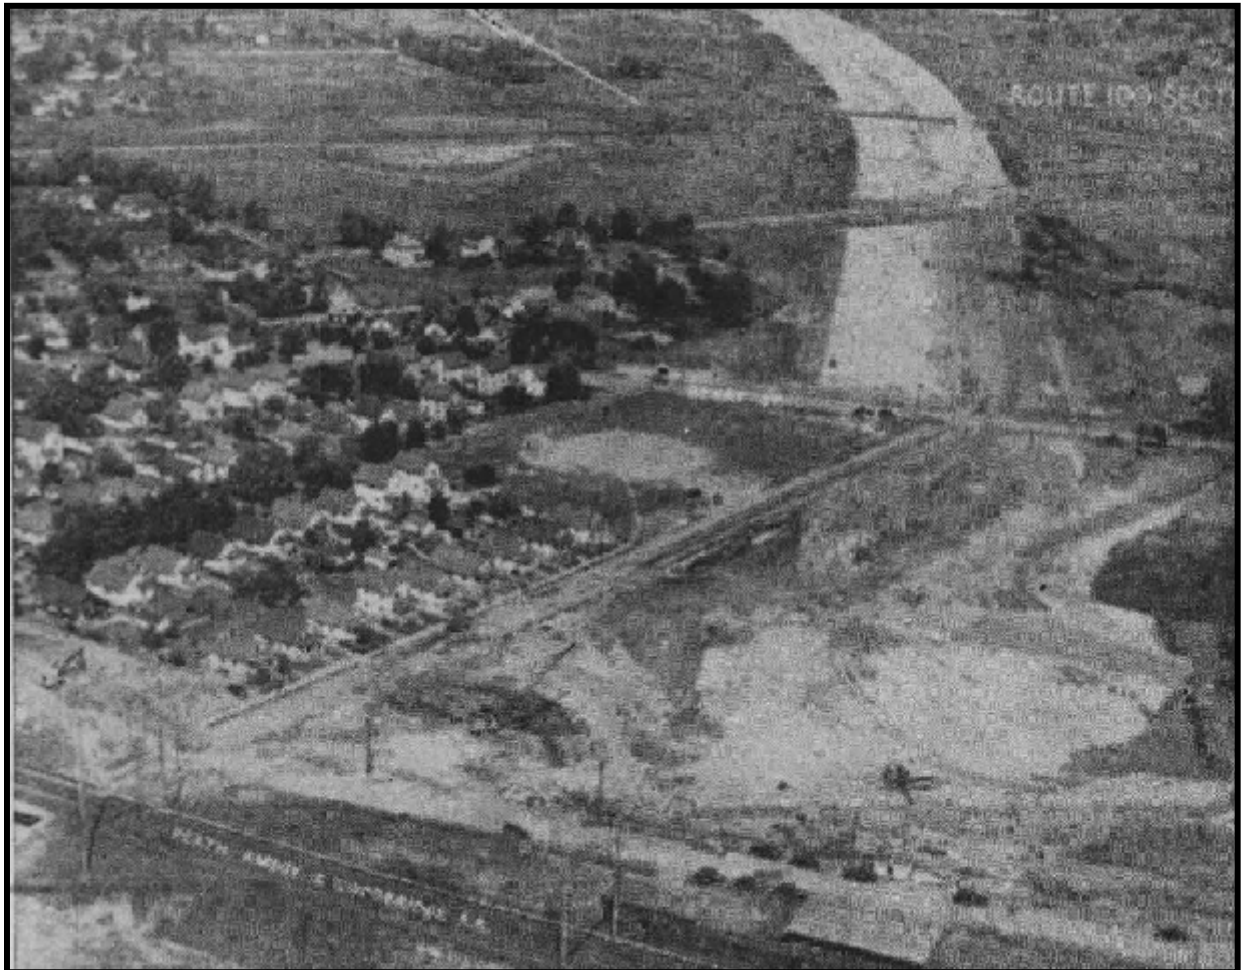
1948 newspaper aerial photograph depicting construction of Route 100 through Woodbury, New Jersey. The alignment was absorbed into the New Jersey Turnpike (Central New Jersey Home News 19 September 1948: 1).
